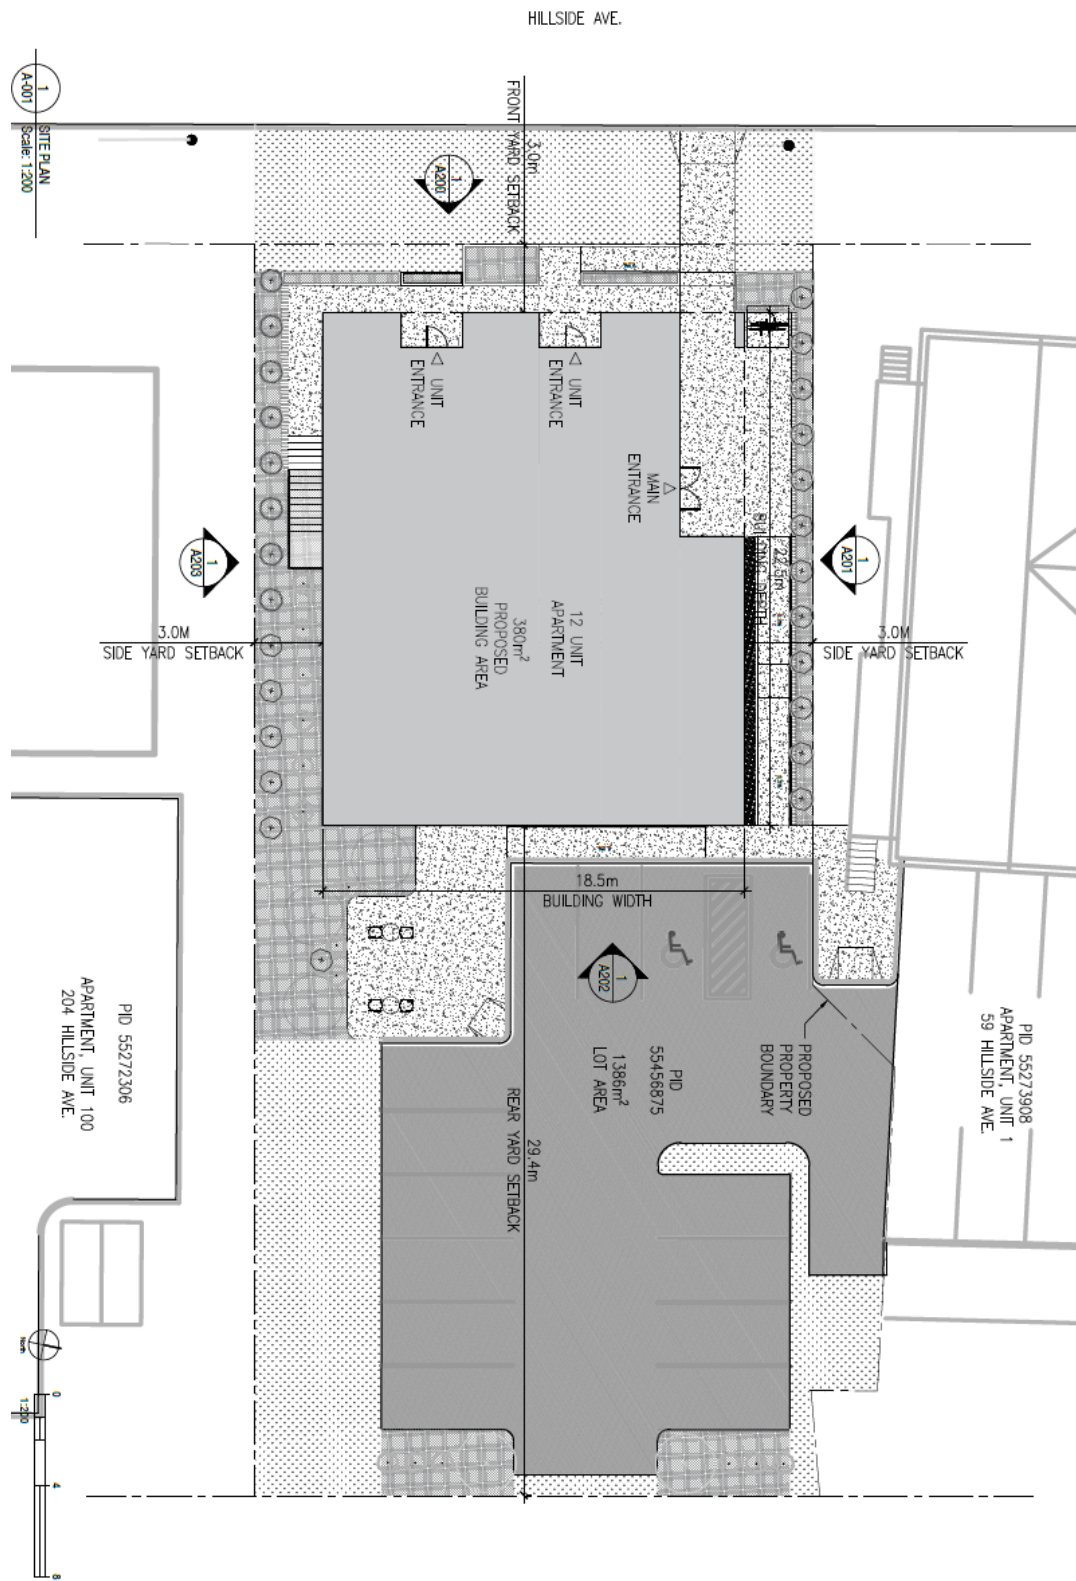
Proposed site plan with shared vehicle access from adjacent PID
